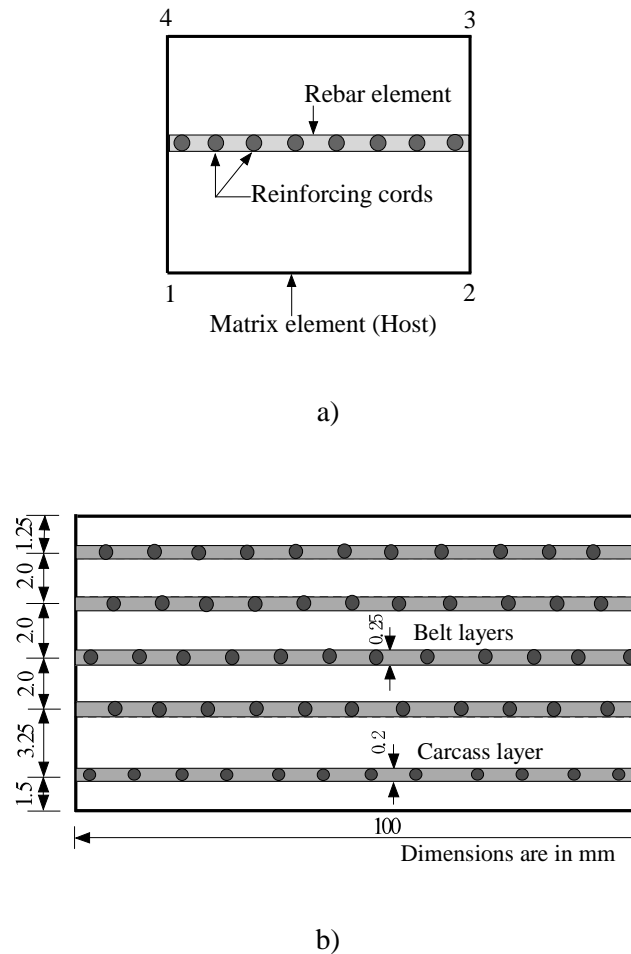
a) Rebar elements and rubber element (host) b) position of steel reinforcing cords in a single layer of STRP
